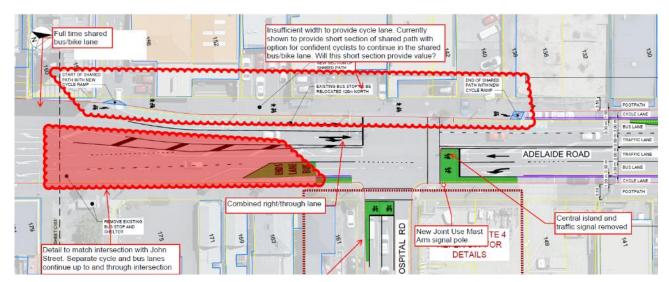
Proposed shared path design option - #156 Adelaide Road
